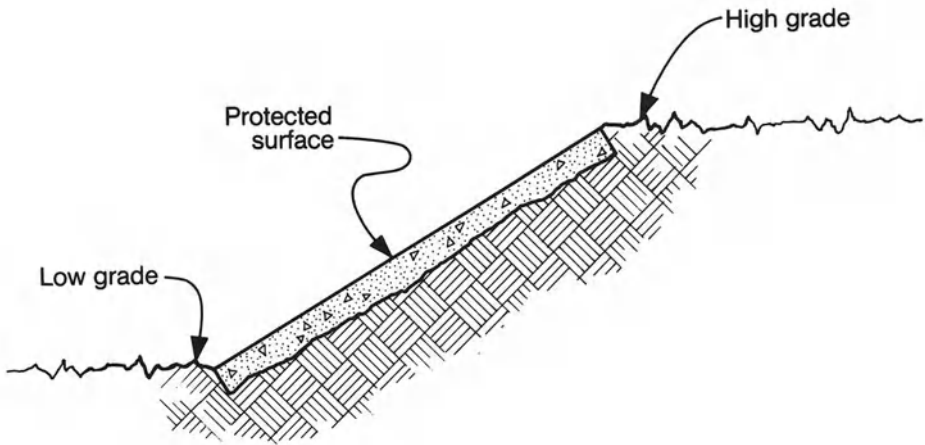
Earth embankment stabilized with a concrete cover.
